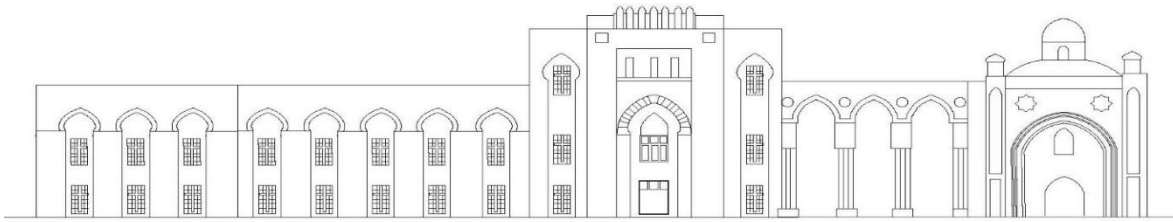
Southern wing interior facade. AutoCAD drawings by author
